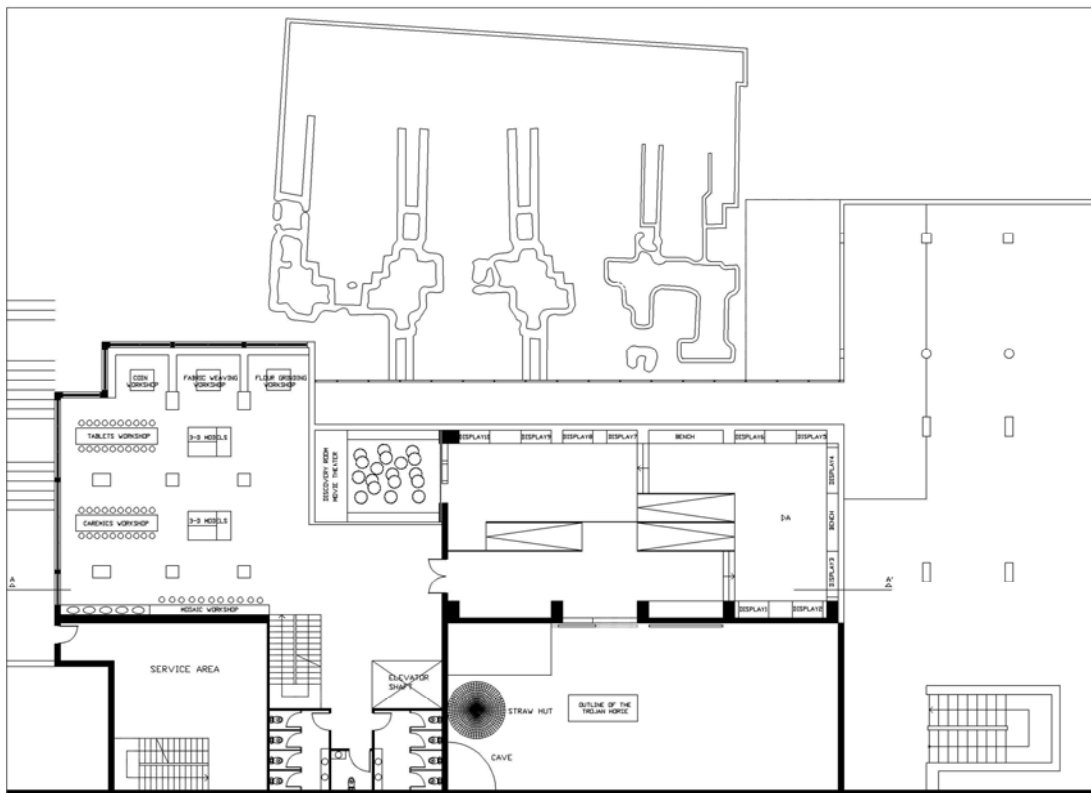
Ground floor plan of the new museum (Drawing by M. Bige Varlier)
